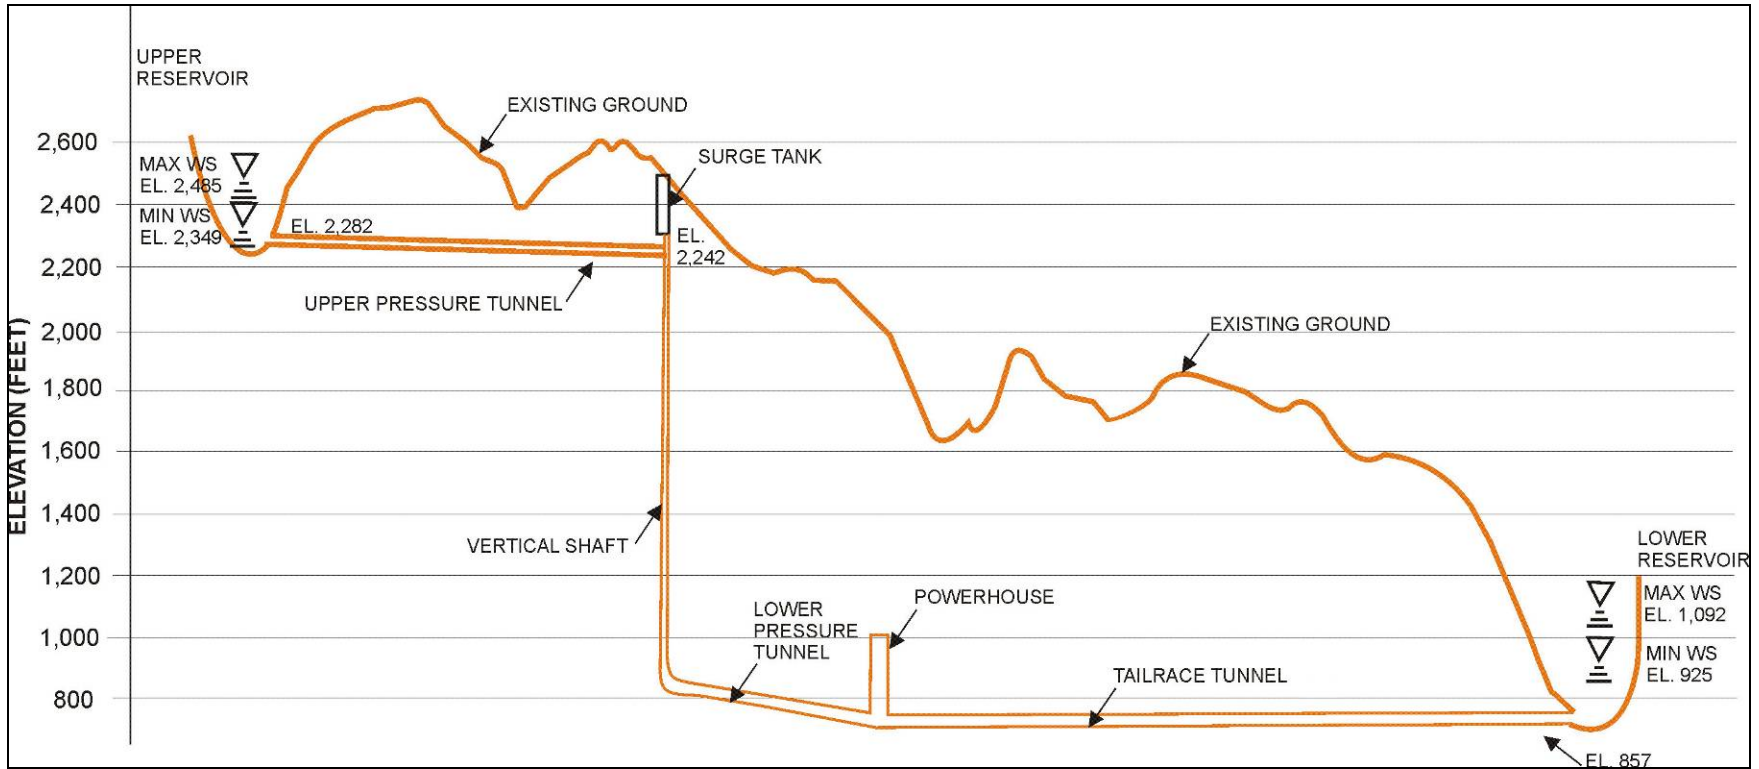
Profile of the proposed Eagle Mountain Pumped Storage Project underground facilities (Source: Eagle Crest, 2009a, as modified by staff).
